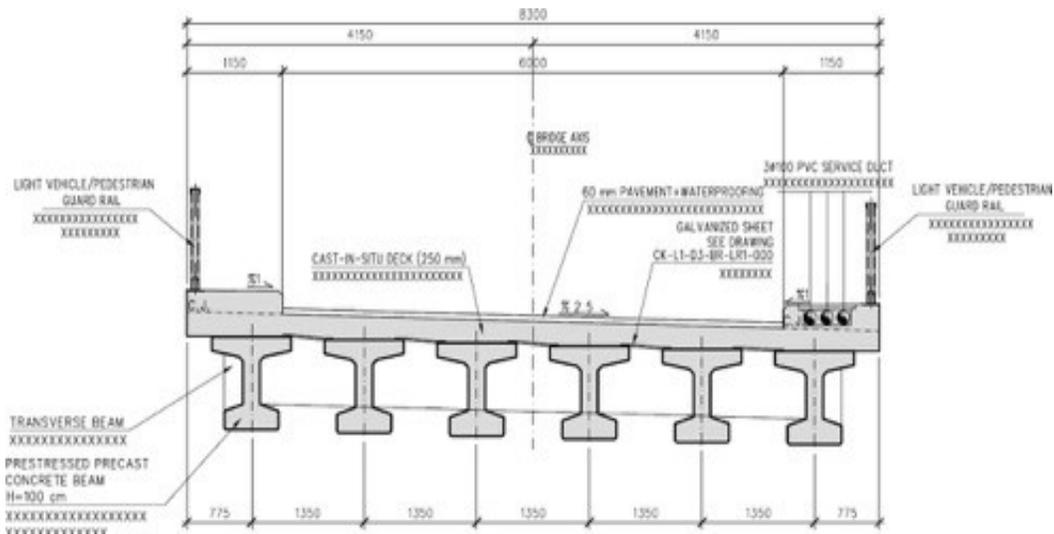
Typical Cross Section of Service Road Bridges
